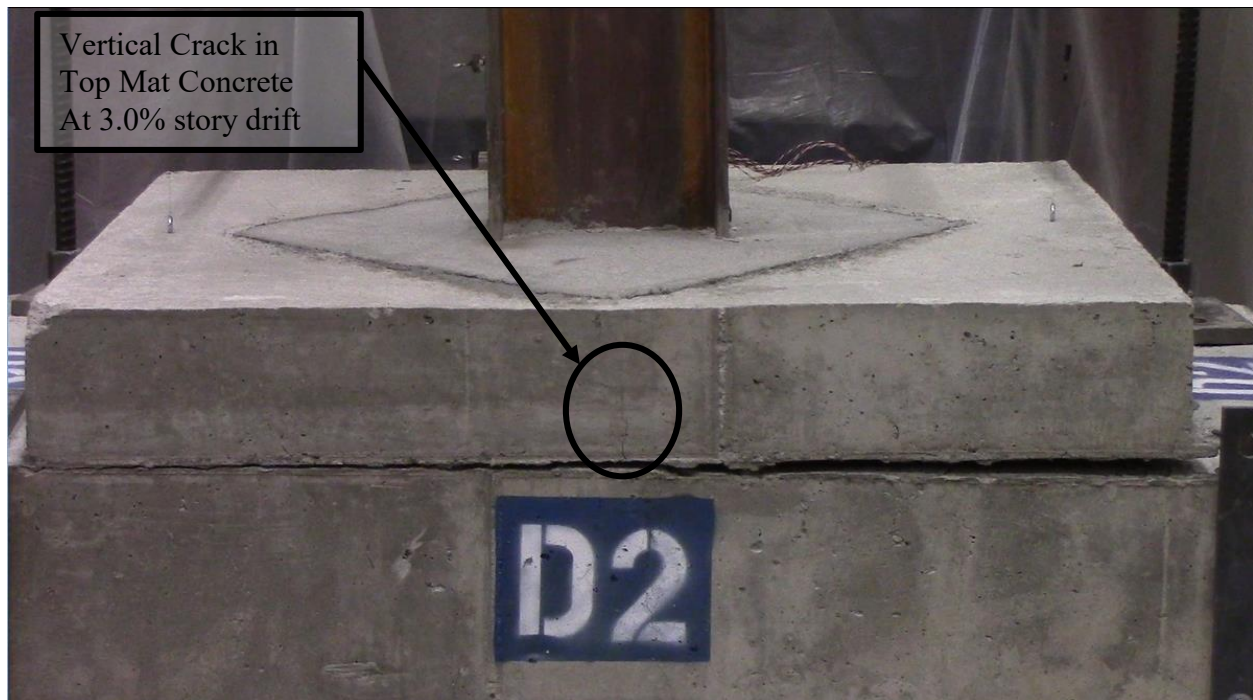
Specimen D2, Vertical Crack in Top Mat
